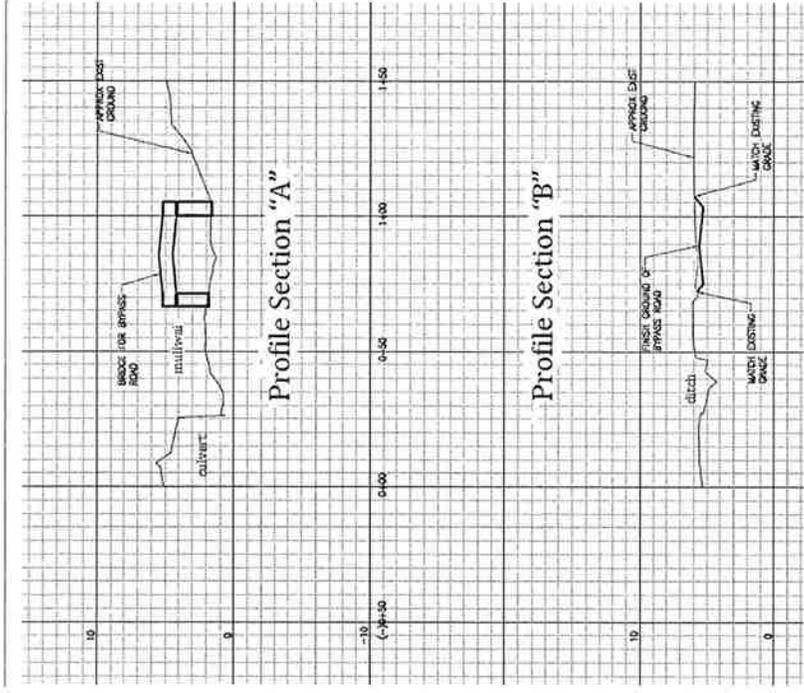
Sections "A" and "B" (see Fig. 6 for locations) of proposed bypass road.
